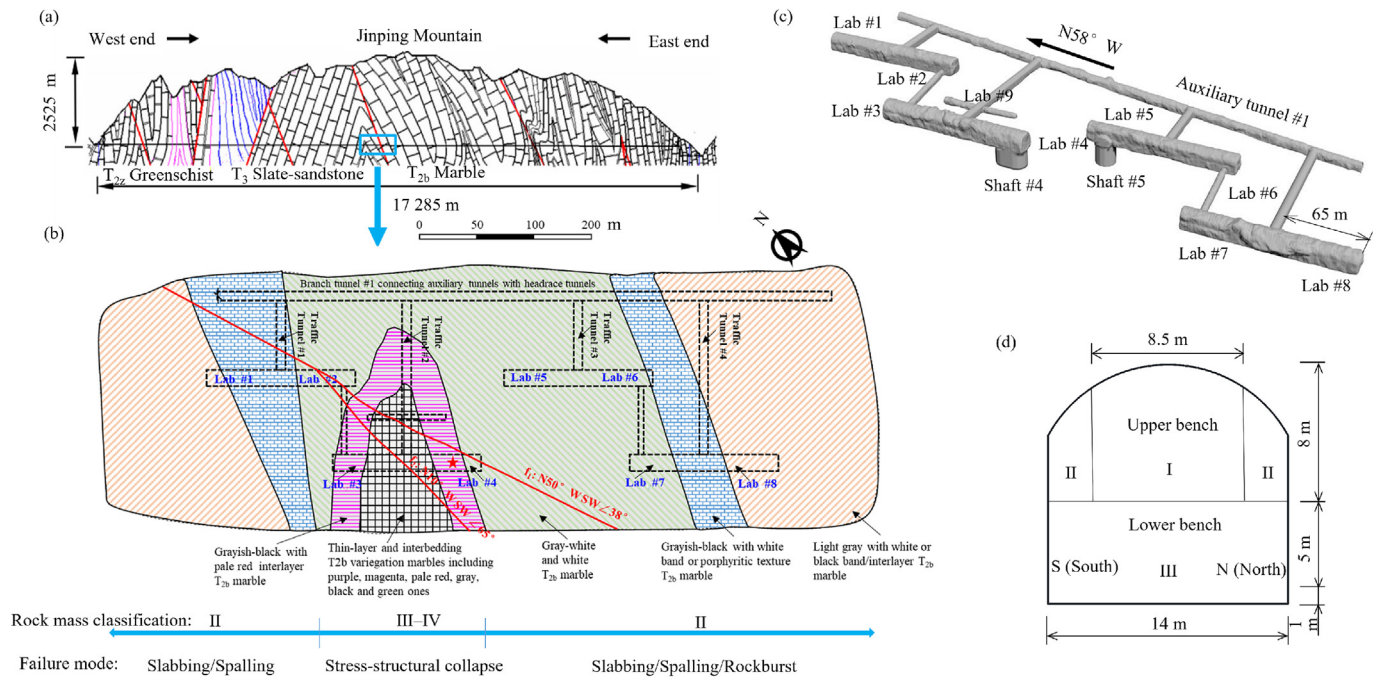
Construction overview of the CJPL-II project. (a)–(b) Geological setting and rock mass failure mode, (c) CJPL-II tunnel group layout, and (d) excavation sequence and tunnel cross-sectional sizes (Feng et al., 2016).
